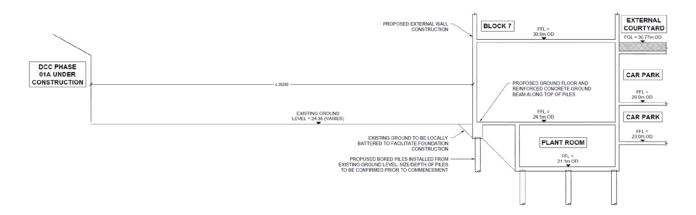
Indicative section of Block 7: DCC Housing (under construction)
